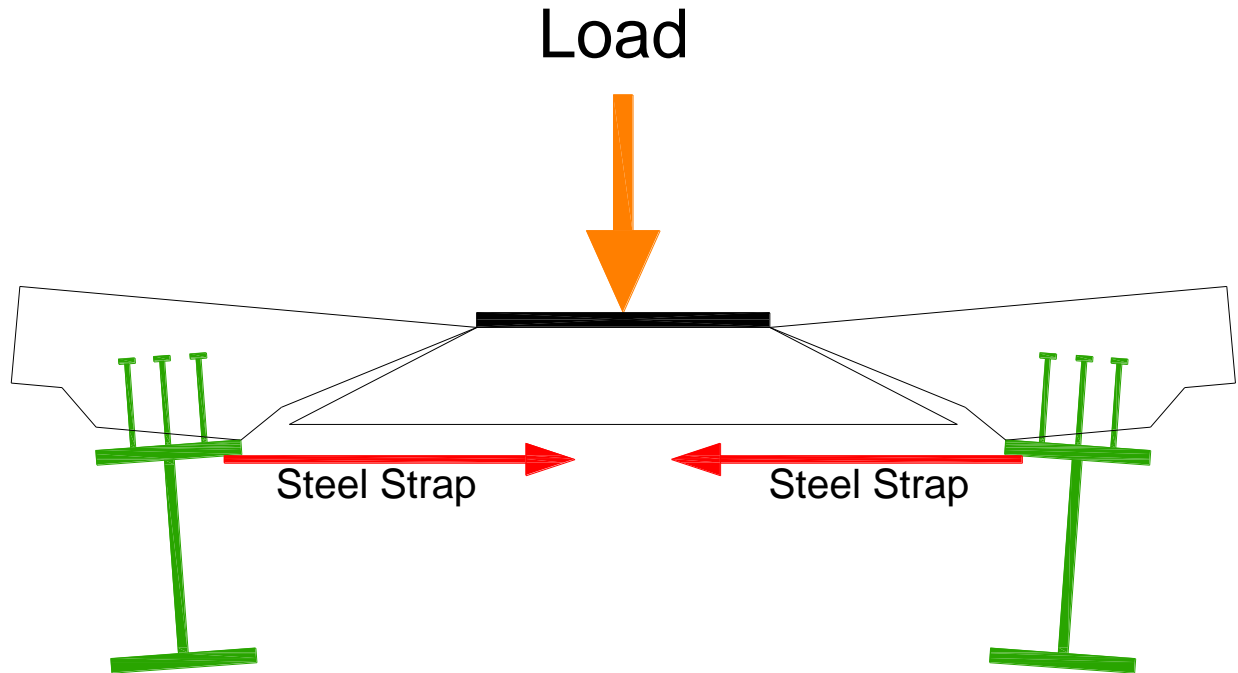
Girder rotation in a steel-free bridge deck slab under concentrated load
